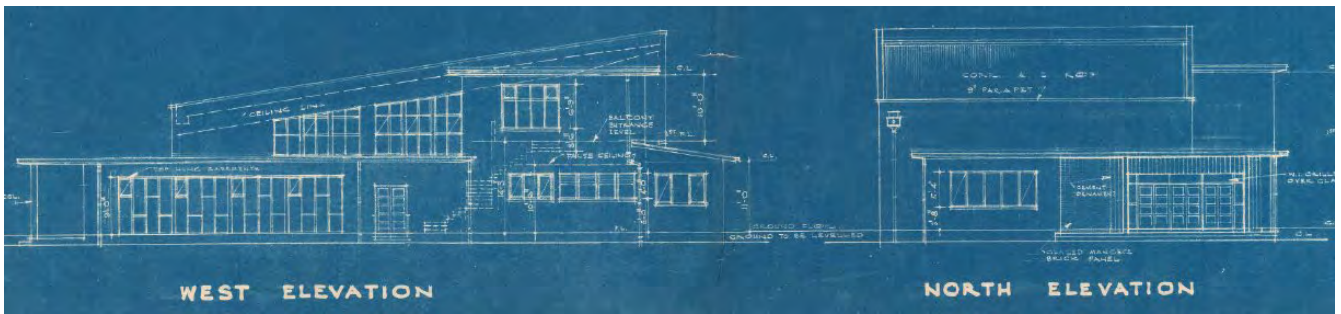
Drawings relating to building permit 2980 (K Popper, undated). North and west elevations of the proposed new synagogue. (Source: Council Building File)
